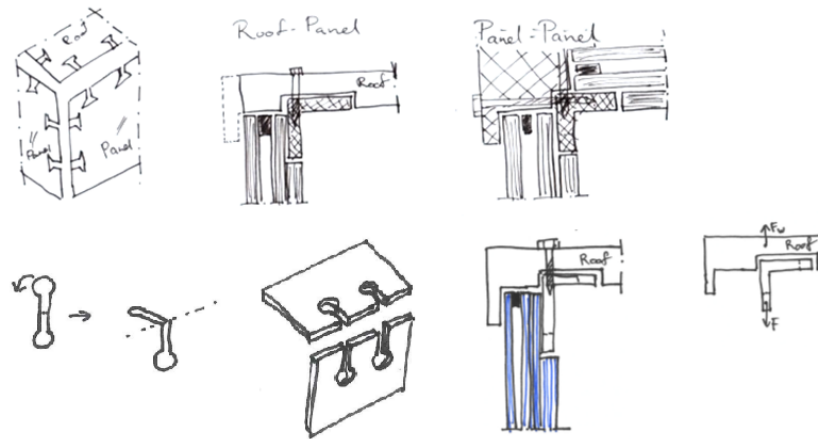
Connection type A.2: Interlocking 2 (- CAD-drawings to come)
